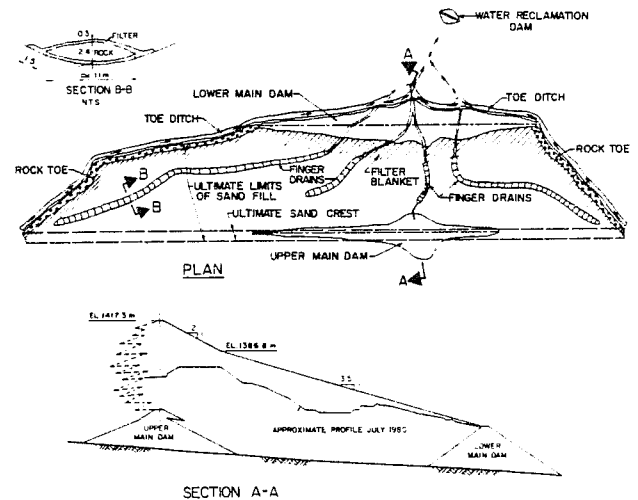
Plan and Section Through Ultimate Brenda Tailings
